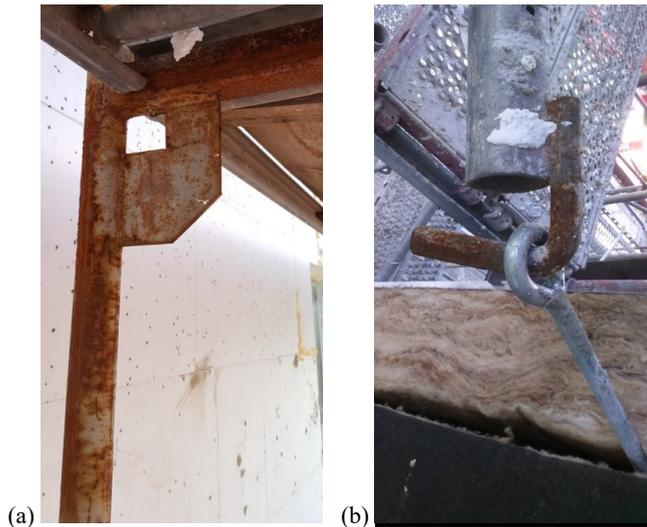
Corrosion on scaffolding elements: (a) steel frame, (b) anchor connector.
